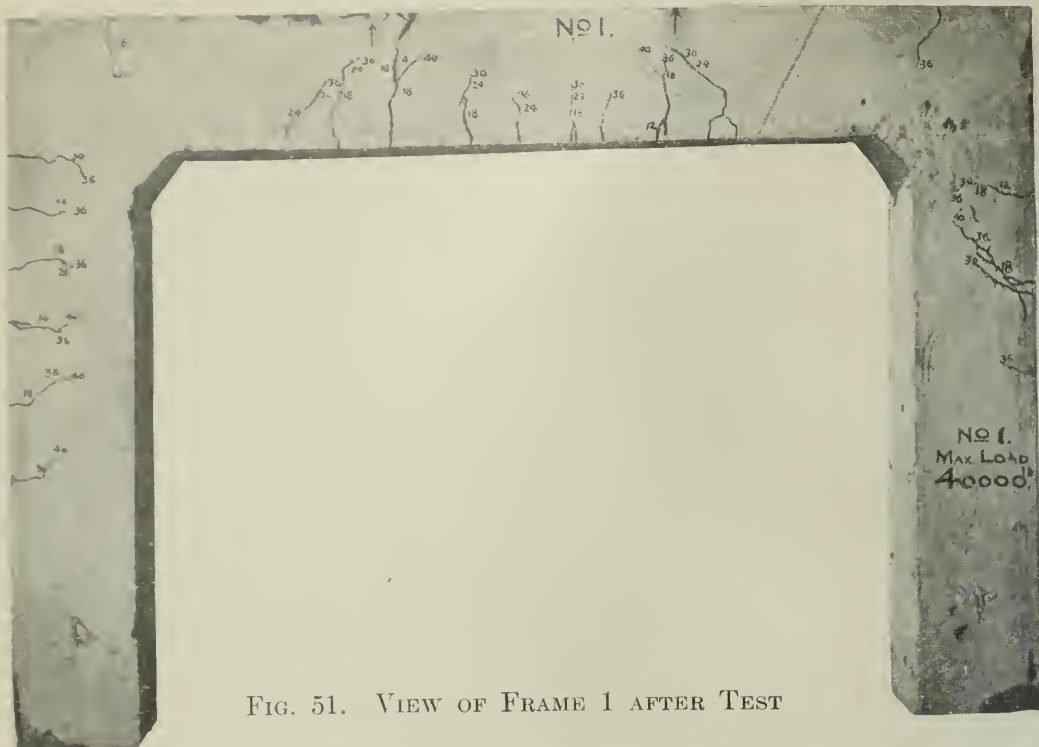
VIEW OF FRAME 1 AFTER TEST
